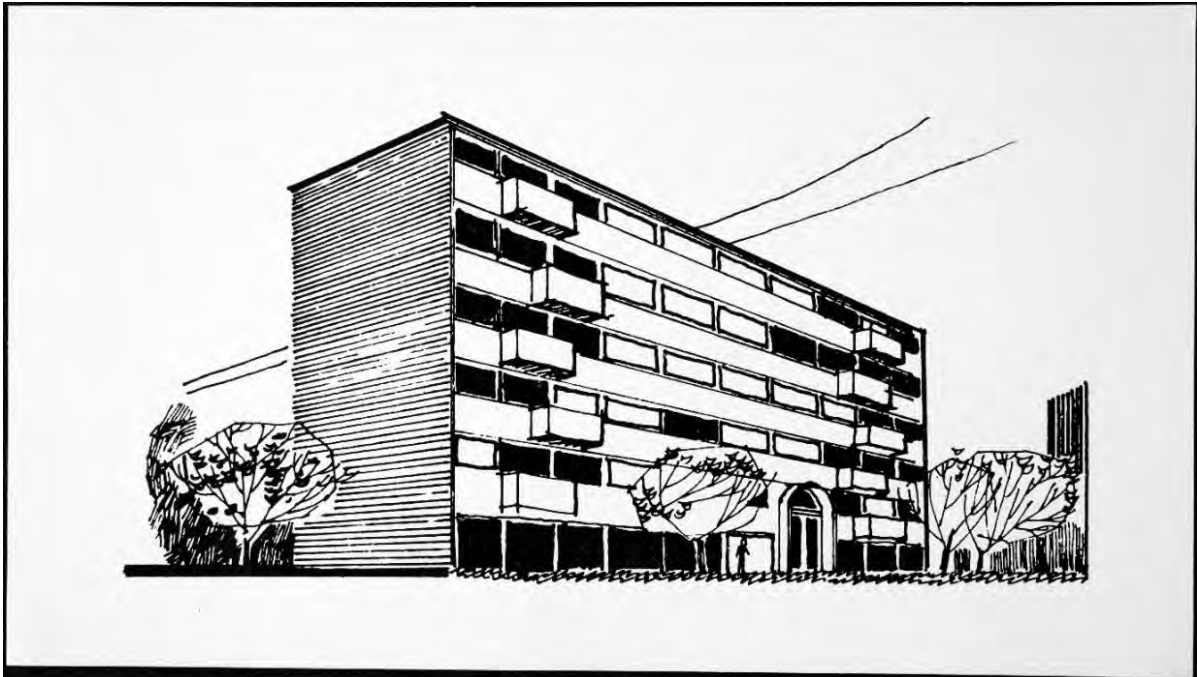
Architect's rendering of proposed new building at International House, c1960s. (Source: University of Melbourne Archives)
